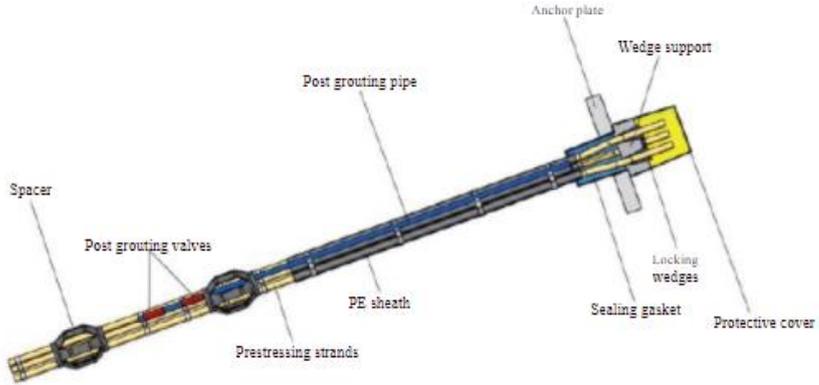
Temporary ground anchor (<http://www.bauerfoundations.com/en/competences/anker.html>)
